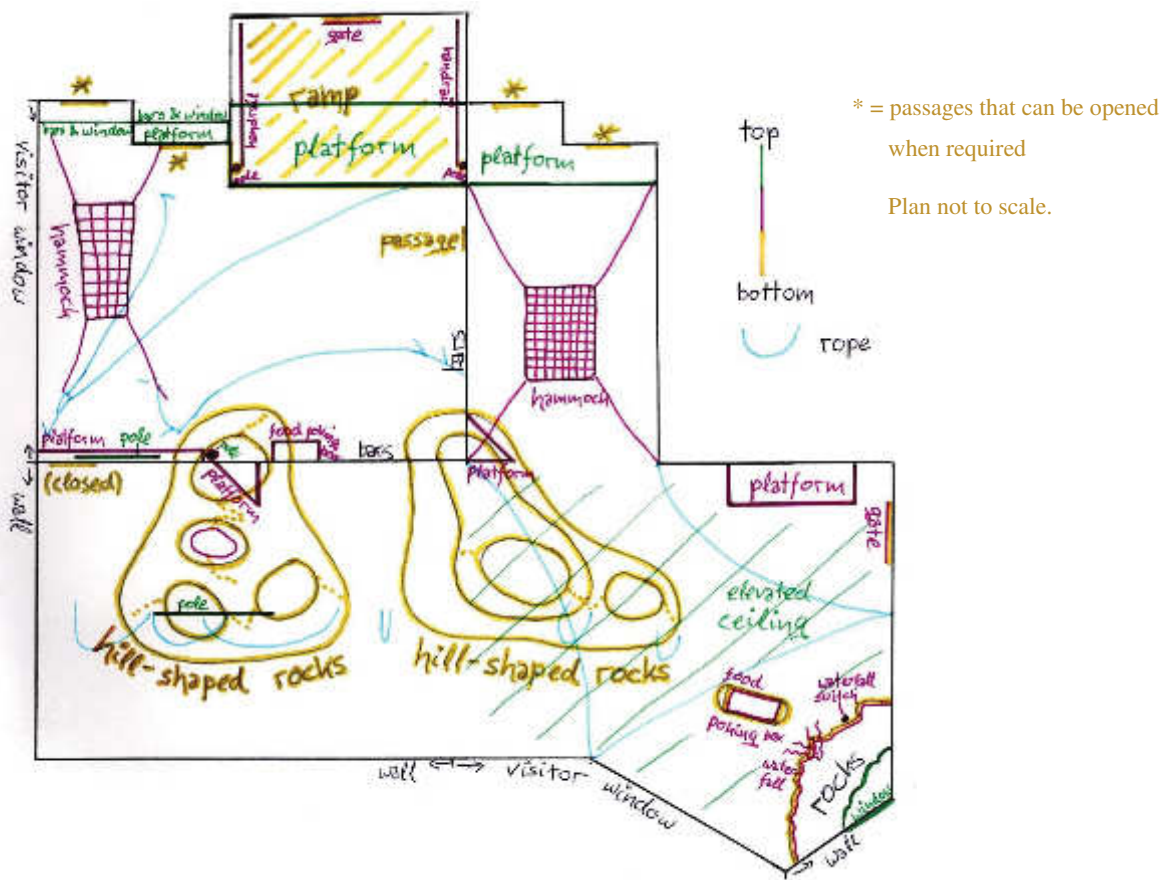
Floor plan of the inside enclosure at Neunkirchen Zoo.
